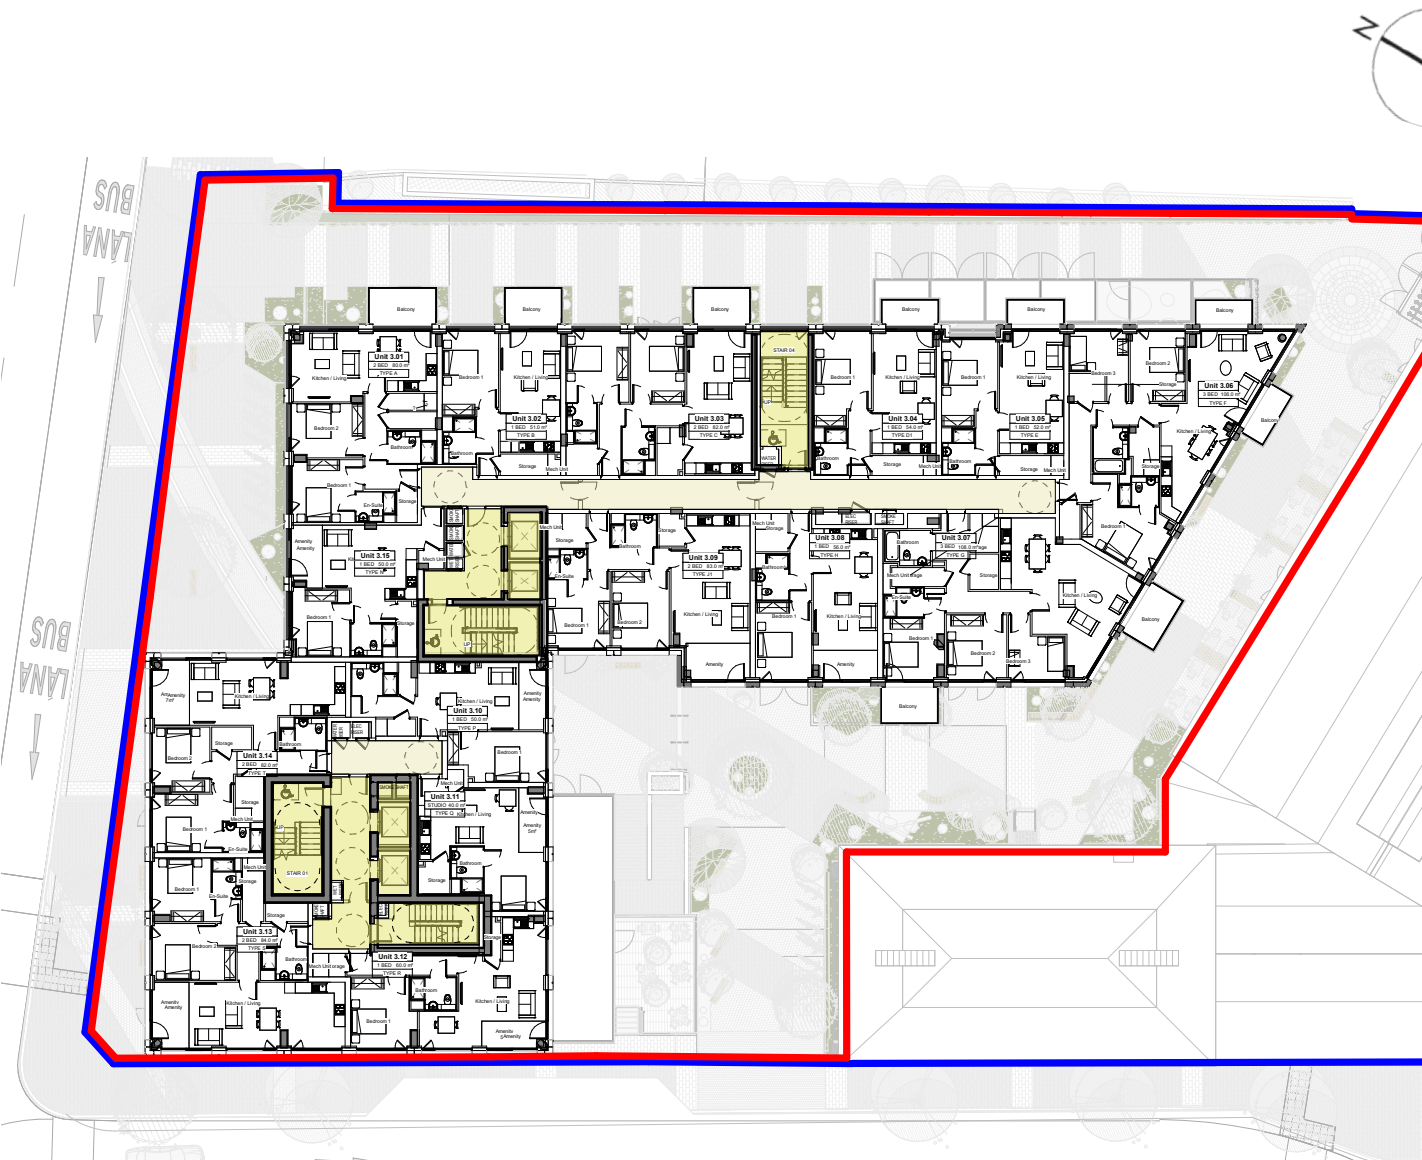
Third Floor Layout Plan showing Cores & Circulation
